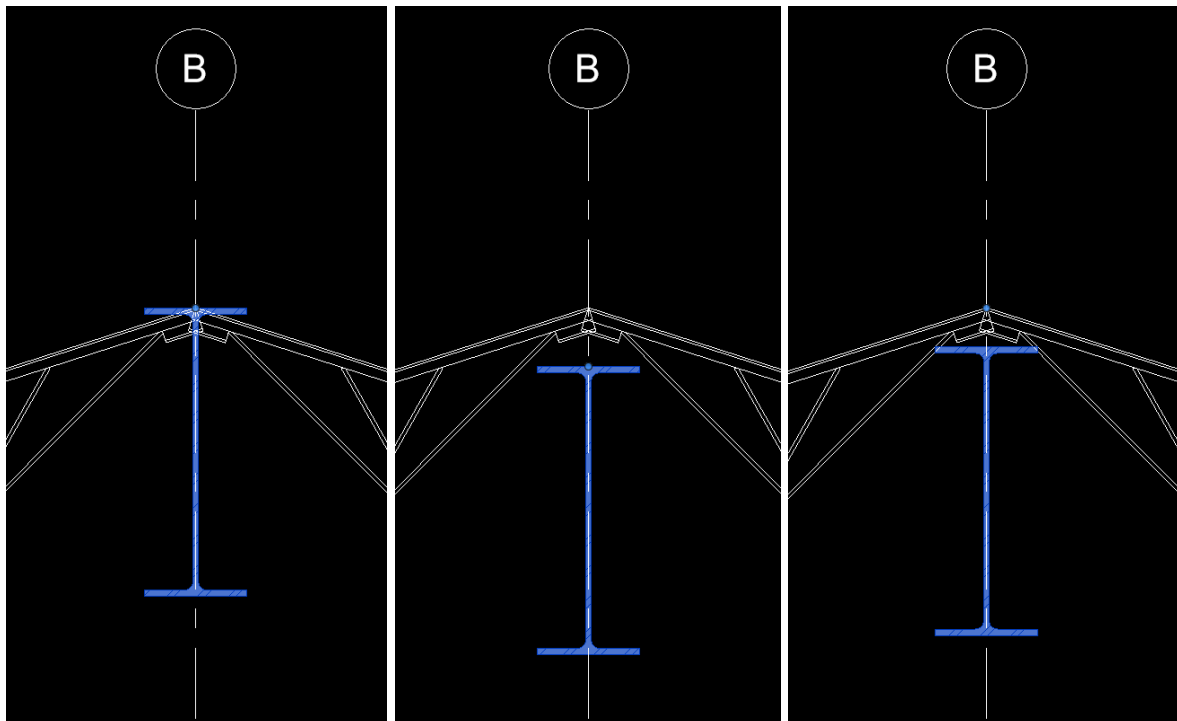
JOIST TO GIRDER CONNECTION WITH AND WITHOUT Z-OFFSET
